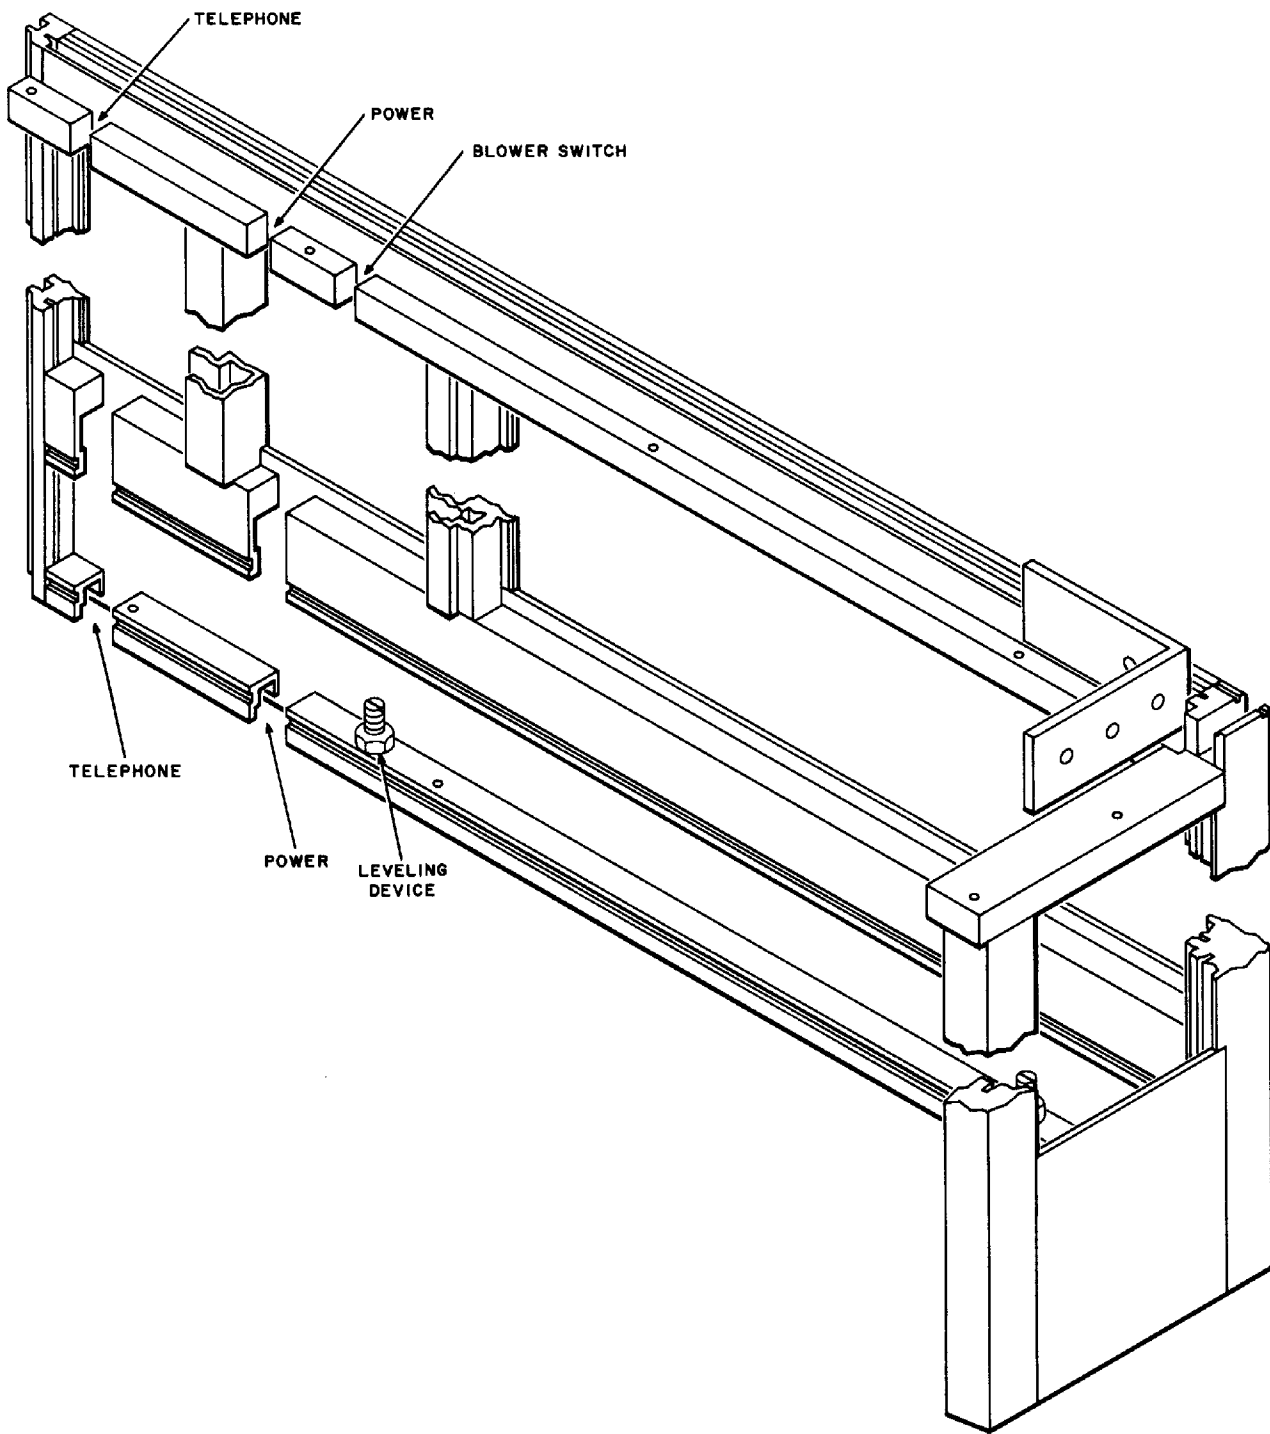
Inside View of F-1 or F-4 Wall Frame
